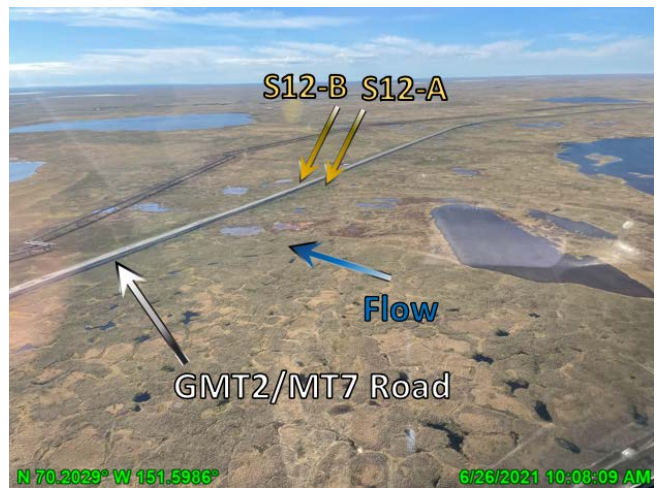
Summer conditions near S12, looking south; June 26, 2021
